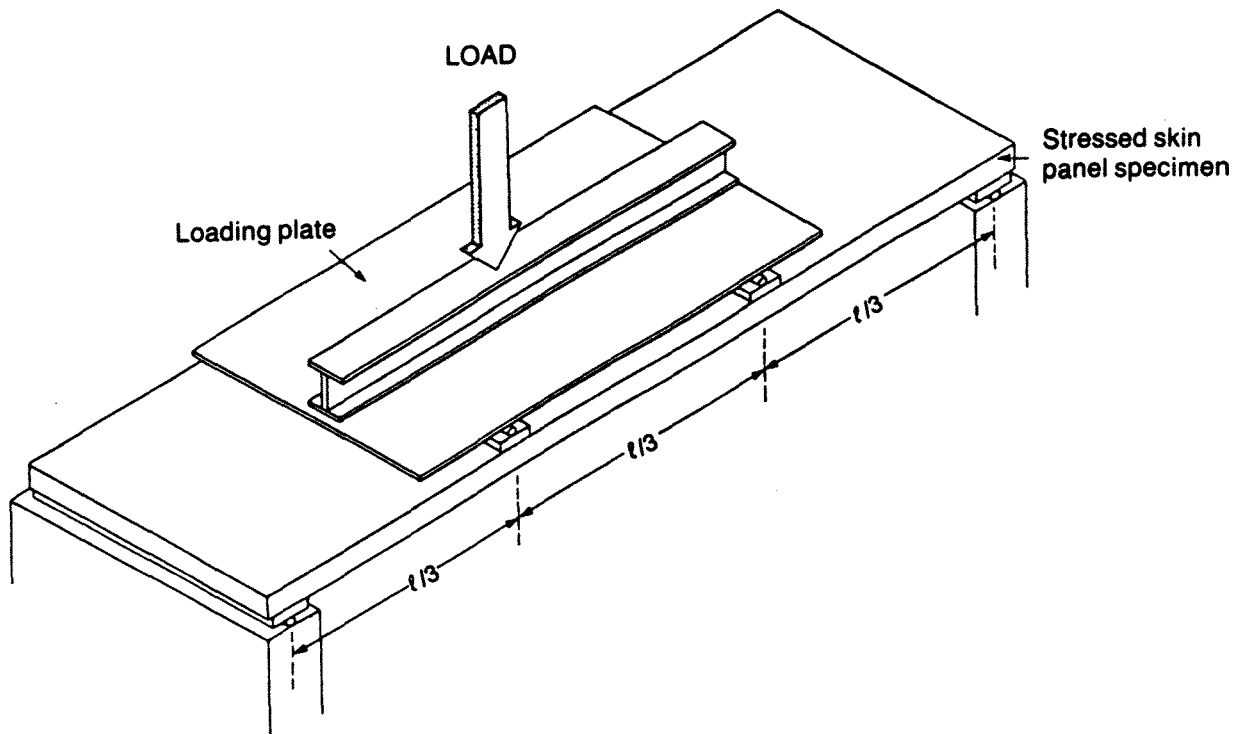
Load test arrangement for short-term and long-term testing of stressed skin panels.
